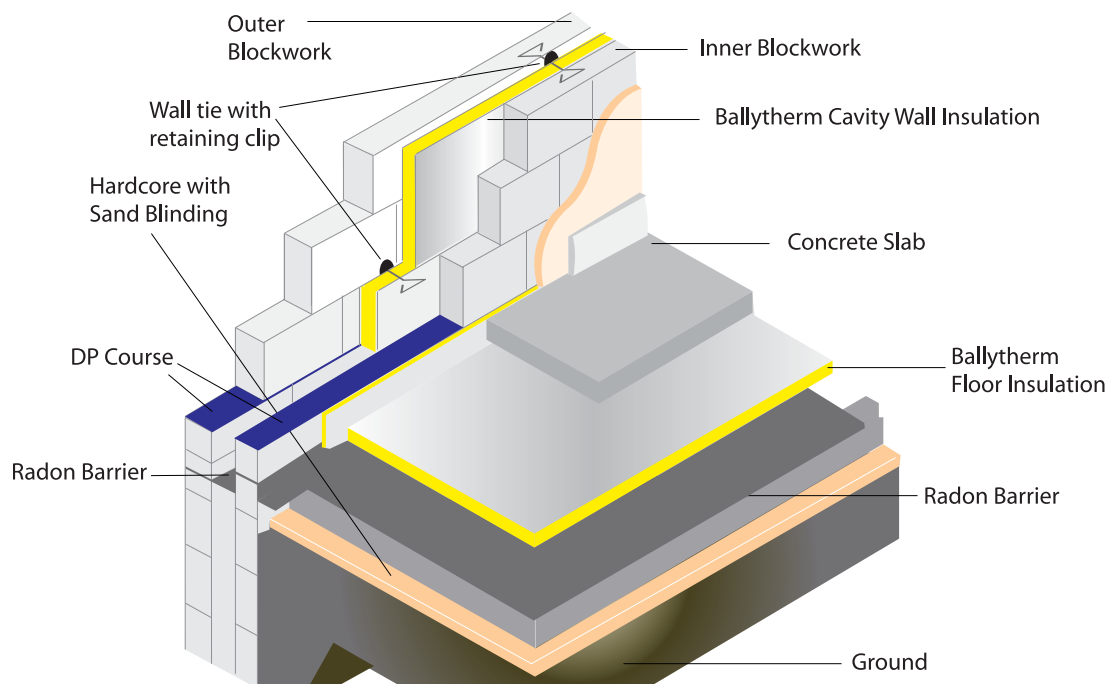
Ballytherm BTF Floor Insulation below floor slab.
